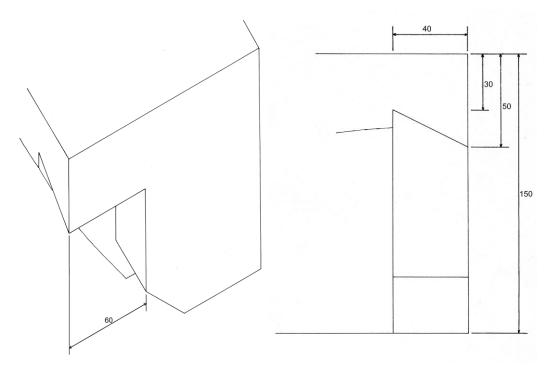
Isometric and side elevation of the remains of the tenon at the west end of lower joist 2 from the floor of room 134. Dimensions in millimetres. This joint appears to relate to the reuse of the timber.
